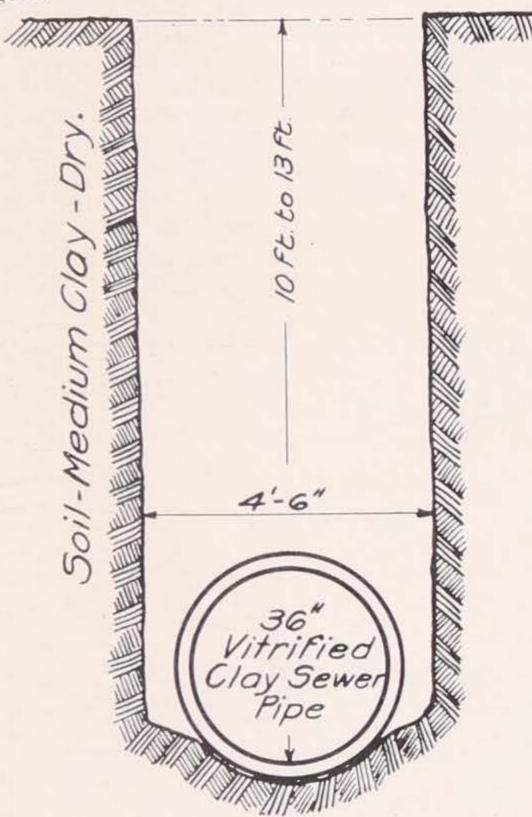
Cracking of 36 Inch Vitrified Clay Sewer Pipe in Ash Street Sewer, Clinton, Iowa.
